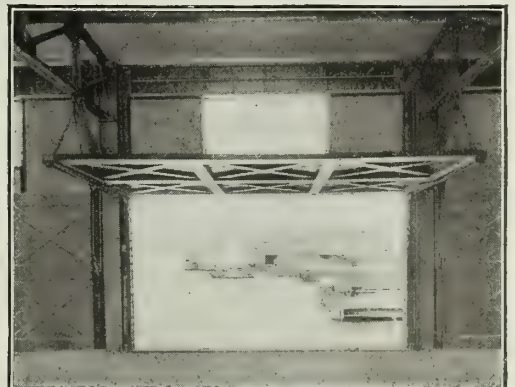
VIEW OF OGDEN SINGLE-SECTION DOOR IN RAISED POSITION
